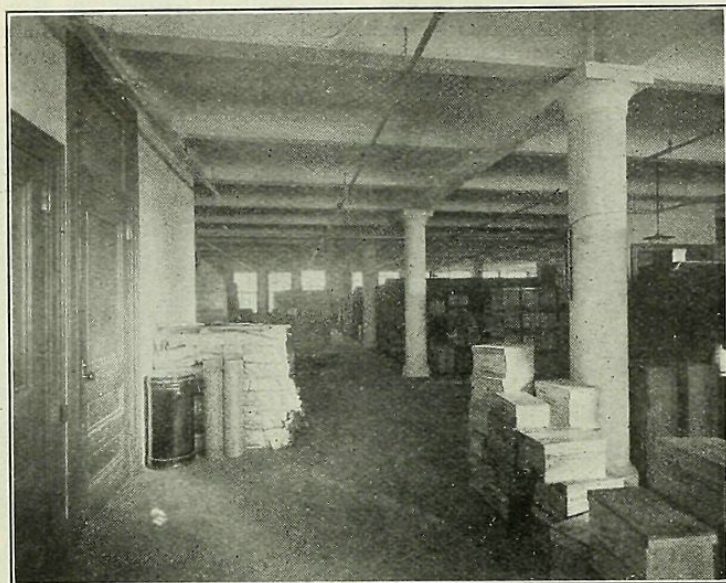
TYPICAL LOFT FLOOR IN EASTMAN KODAK BUILDING. 23d Street, Manhattan.
